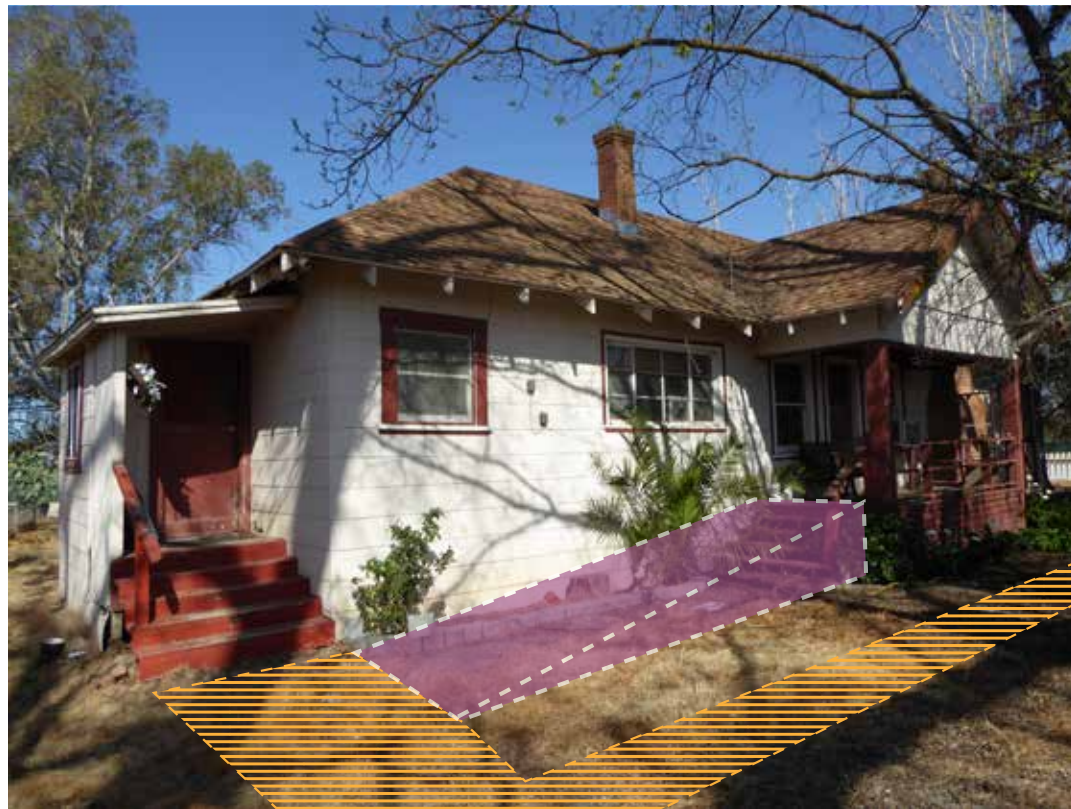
Possible location of an accessible ramp at the south facade of the Ranch House.
